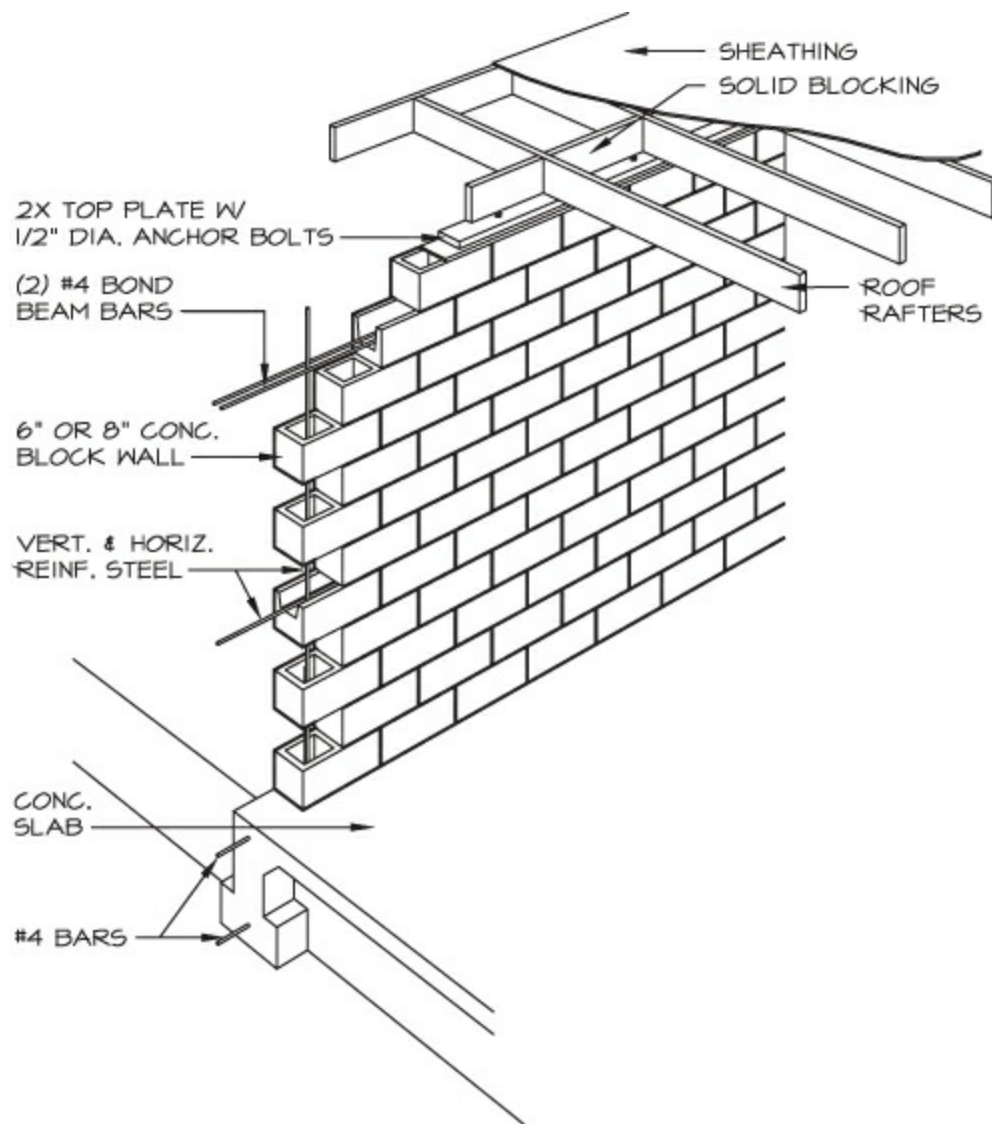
(#) Section of reinforced grouted brick masonry wall.
